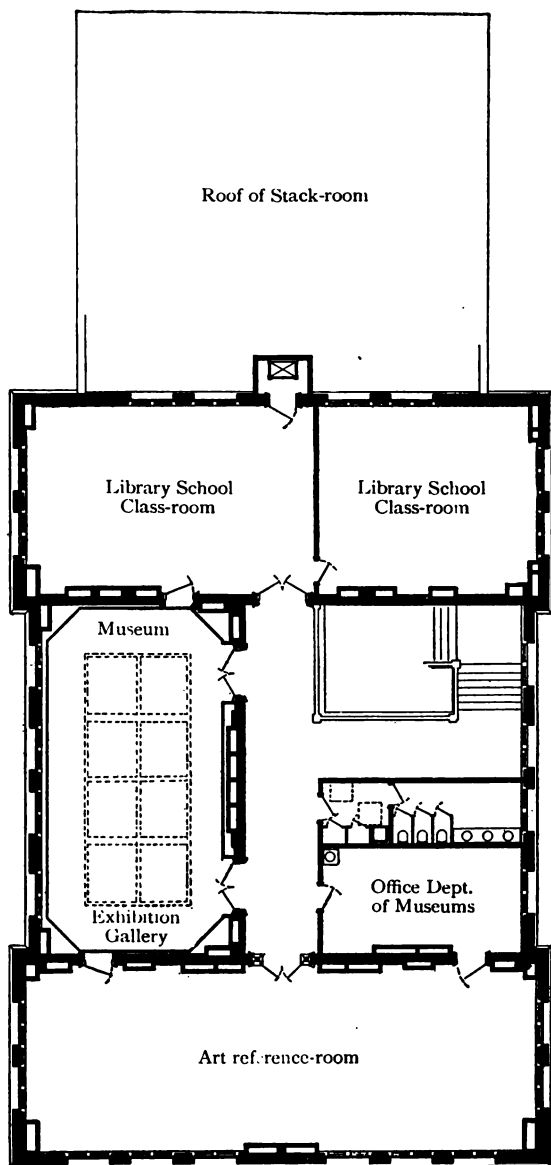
Second floor plan of the Pratt Institute, Brooklyn.
